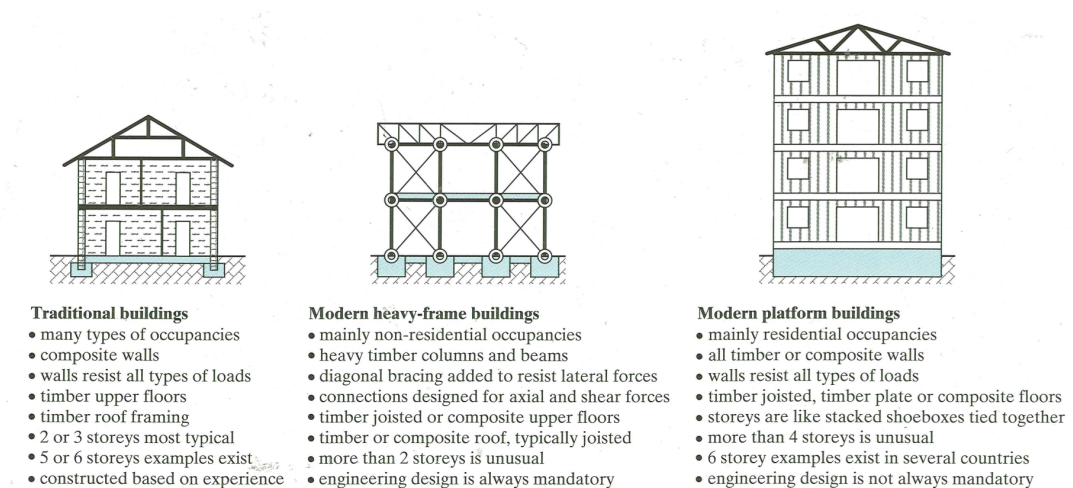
Common structural forms for low- and medium-rise timber buildings (Smith and Frangi, 2008)
